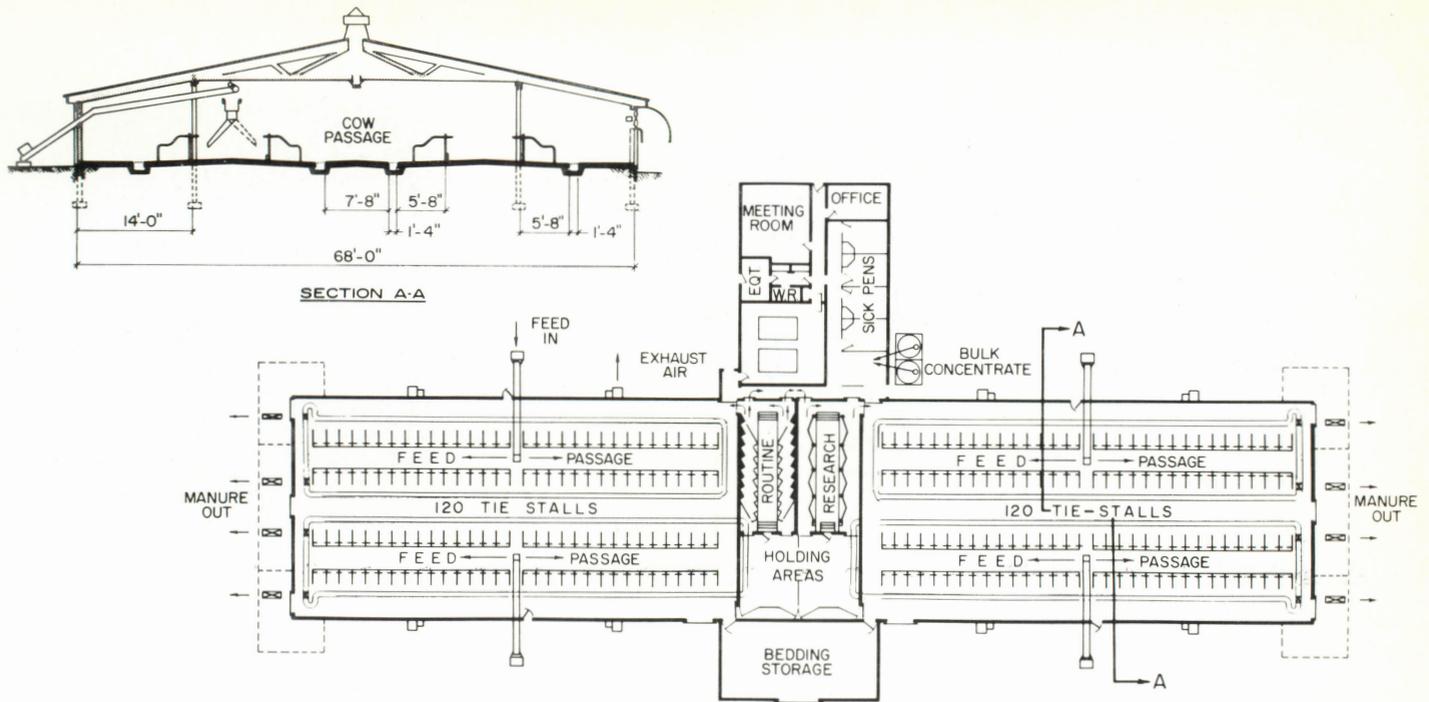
Floor plan and section of Barn 210, tie-stall milking barn.
